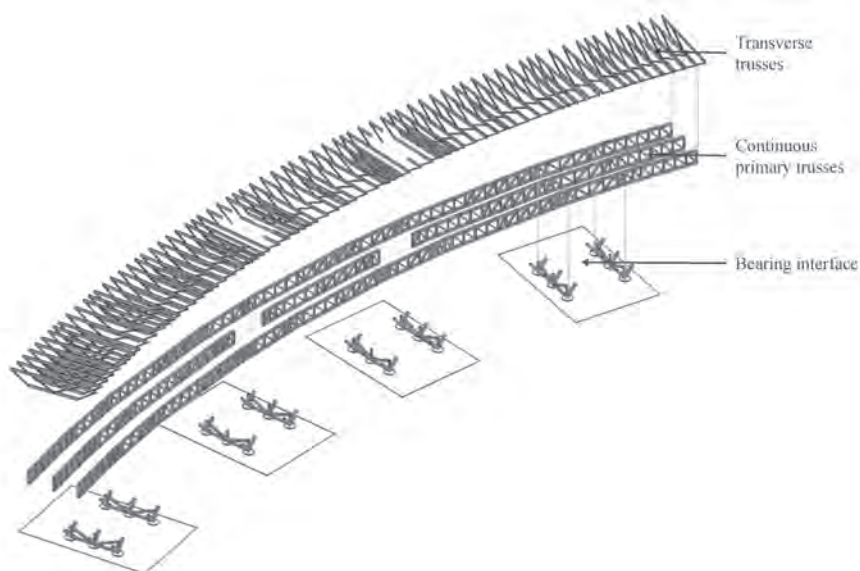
Conservatory truss arrangement diagram (Source: Safdie Architects)
